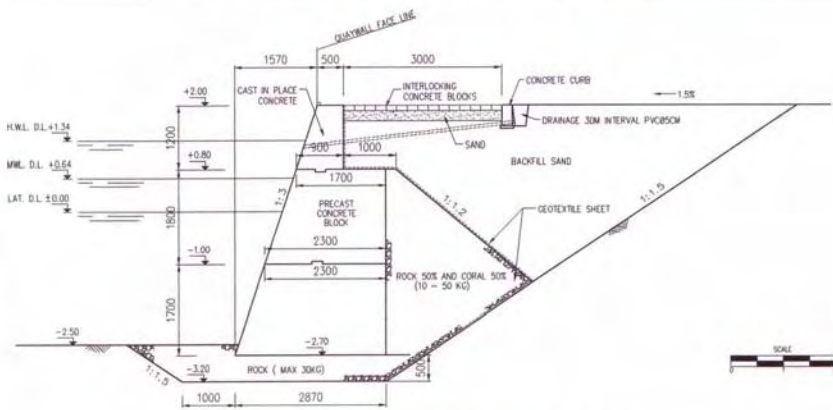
Partial Reconstruction Plan of Quaywall (Depth: D.L.-2.50)
